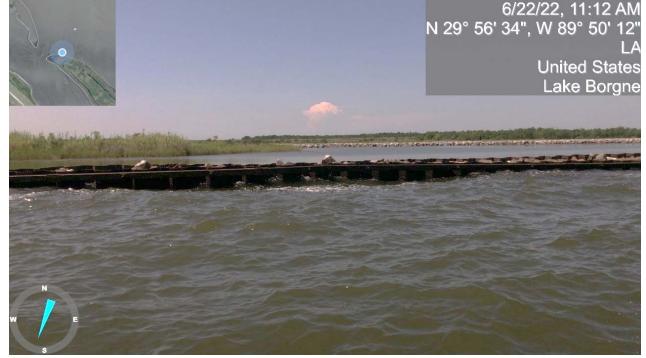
Reach 2 Double steel sheet pile structure appears to be functioning well, although significant corrosion was noted.
